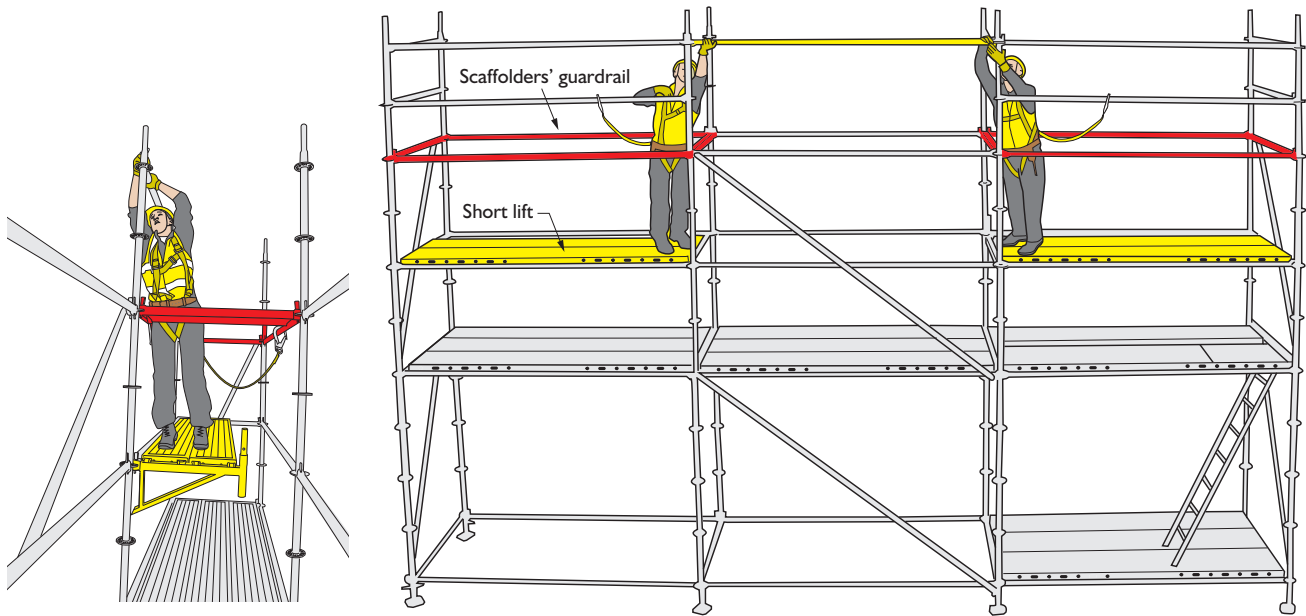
System scaffold side brackets used to create a scaffolders' step platform in alternate bays. The middle bays can be reached from adjacent bays to fix the guardrails.
